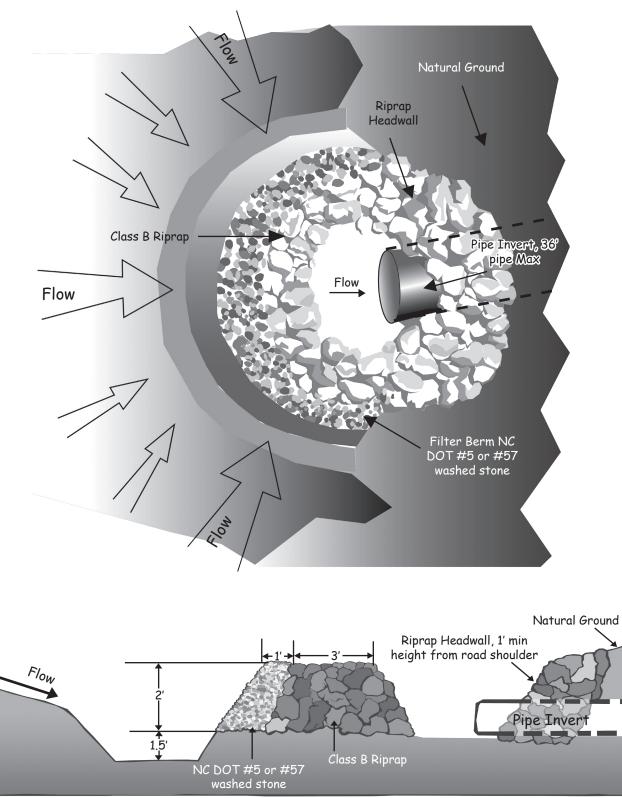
Rock pipe inlet protection plan view and cross-section view
